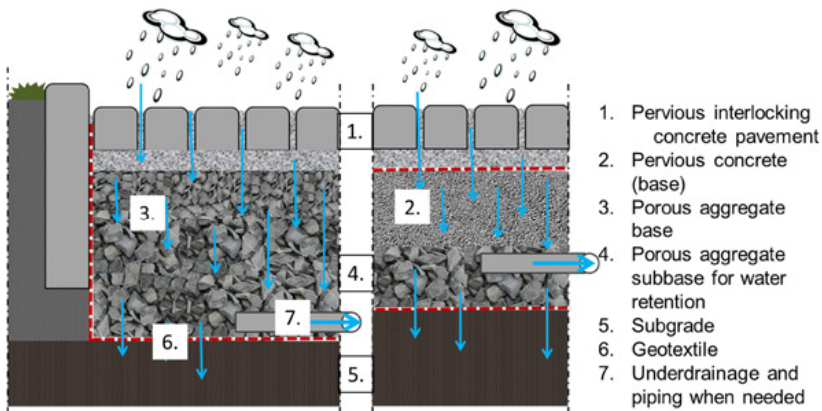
Examples on climate-adaptive surfaces, i.e. pervious pavements. Surface layer is designed to have high water permeability, and base and subbase structures are with high porosity and permeability, and are designed for water detention.
